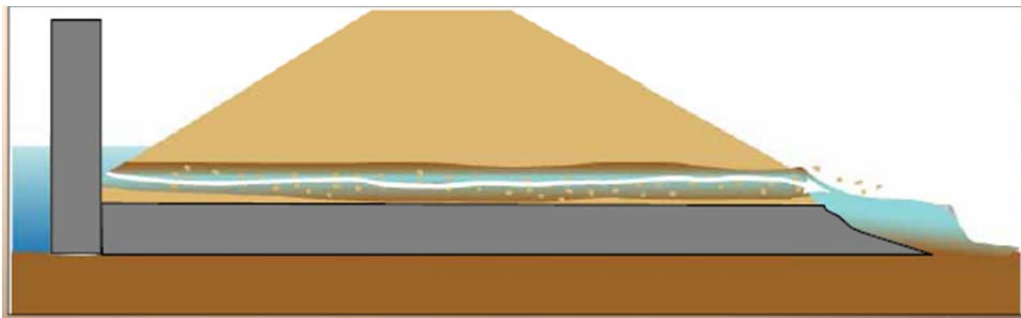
Piping into a flaw in an outlet works conduit.
